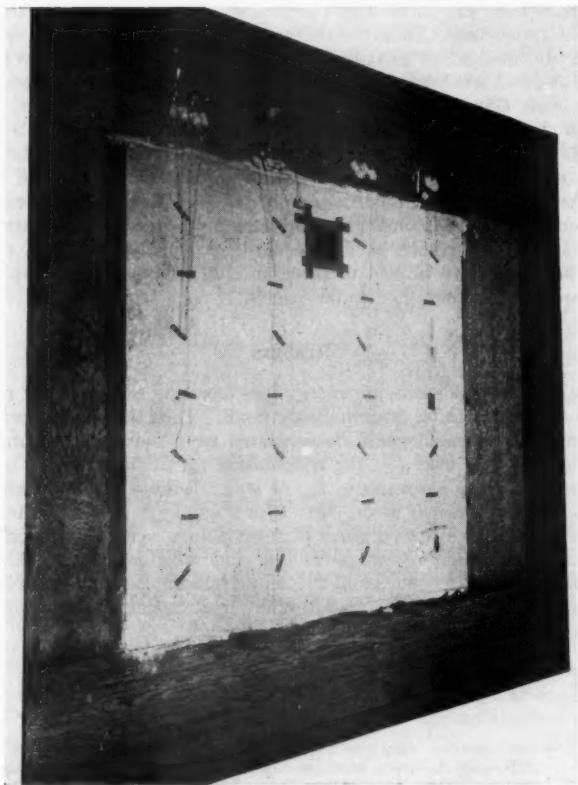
BOTTOM VIEW OF TEST PANEL LOCATED IN CEILING
